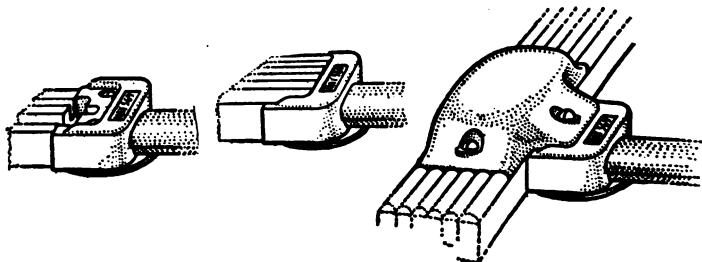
,044 and 7,045.—Metal moulding branching fittings. Fig. 7,044 shows the moulding running up the sidewall, branching both ways close up in the corner on the sidewall, running out onto the ceiling and a tap passing up through to the floor above in  $\frac{1}{2}$  inch conduit. Fig. 7,045 shows the moulding running up the sidewall, branching both ways close up in the corner on the ceiling and running out onto the ceiling.
